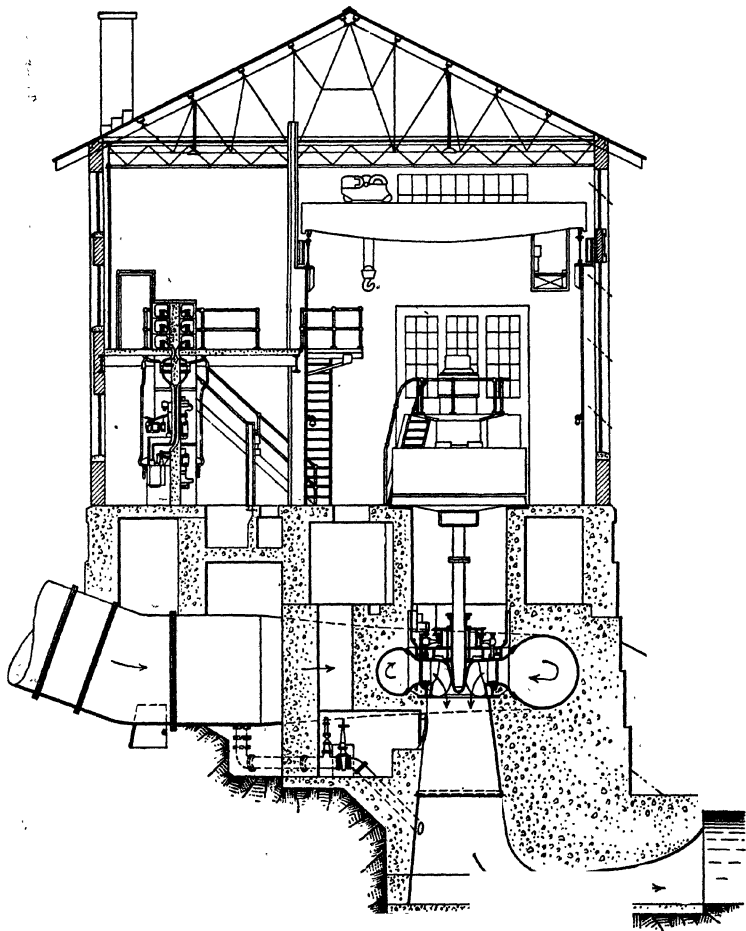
Cross Section of Sturgeon Pool Power House.
